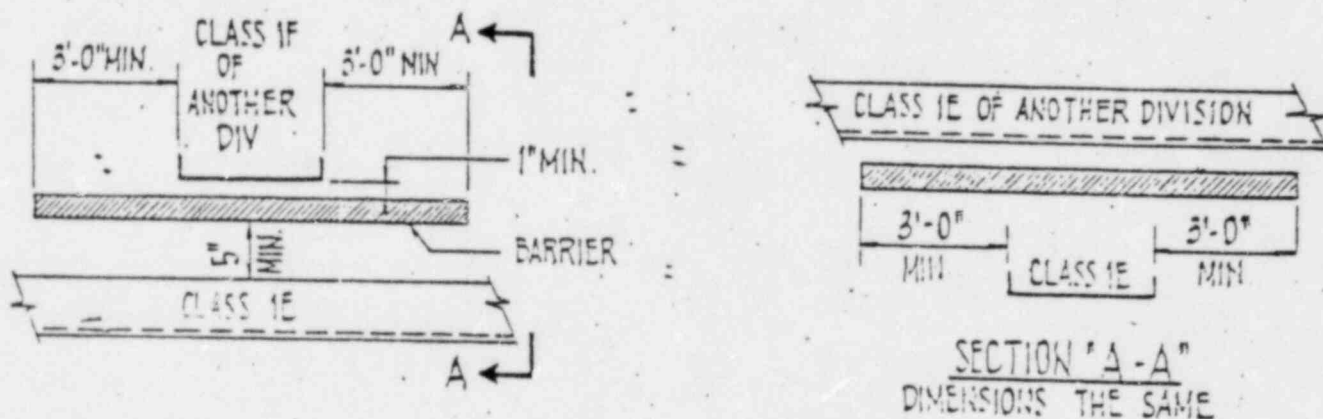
ARRANGEMENT FOR CLASS 1E CABLE TRAY CROSSINGS
